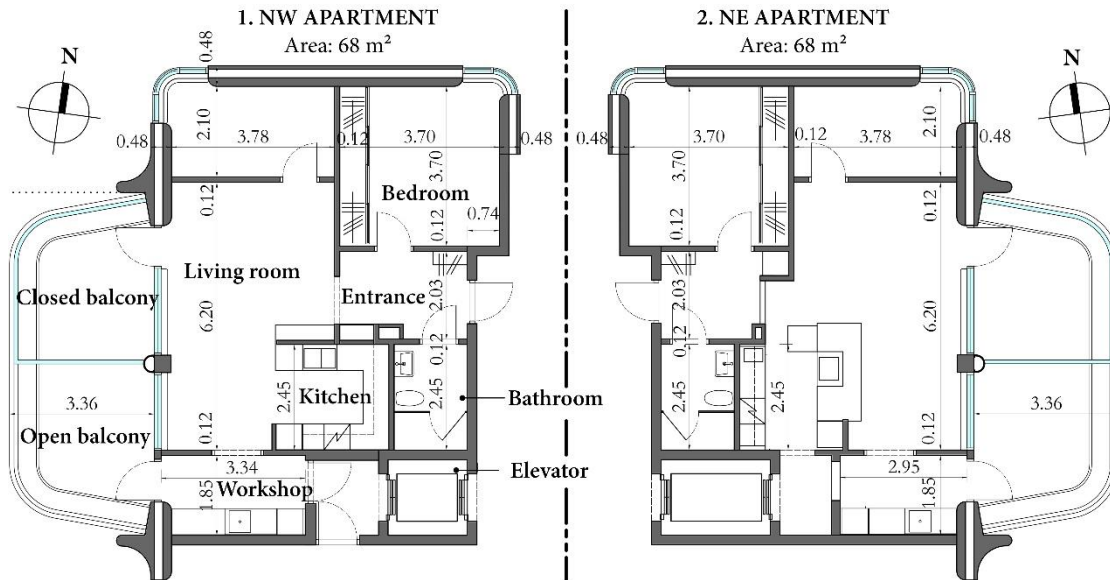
Plan layout of northwest (NW) apartment 1 and northeast (NE) apartment 2.
